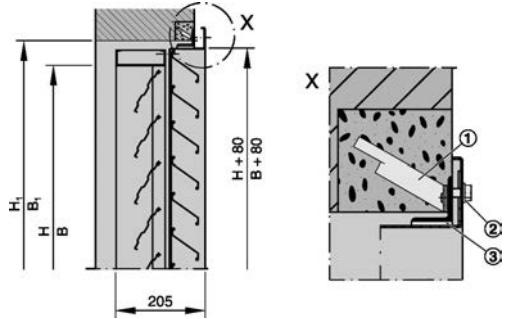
Installation with installation subframe (WG-KUL-1 shown)
